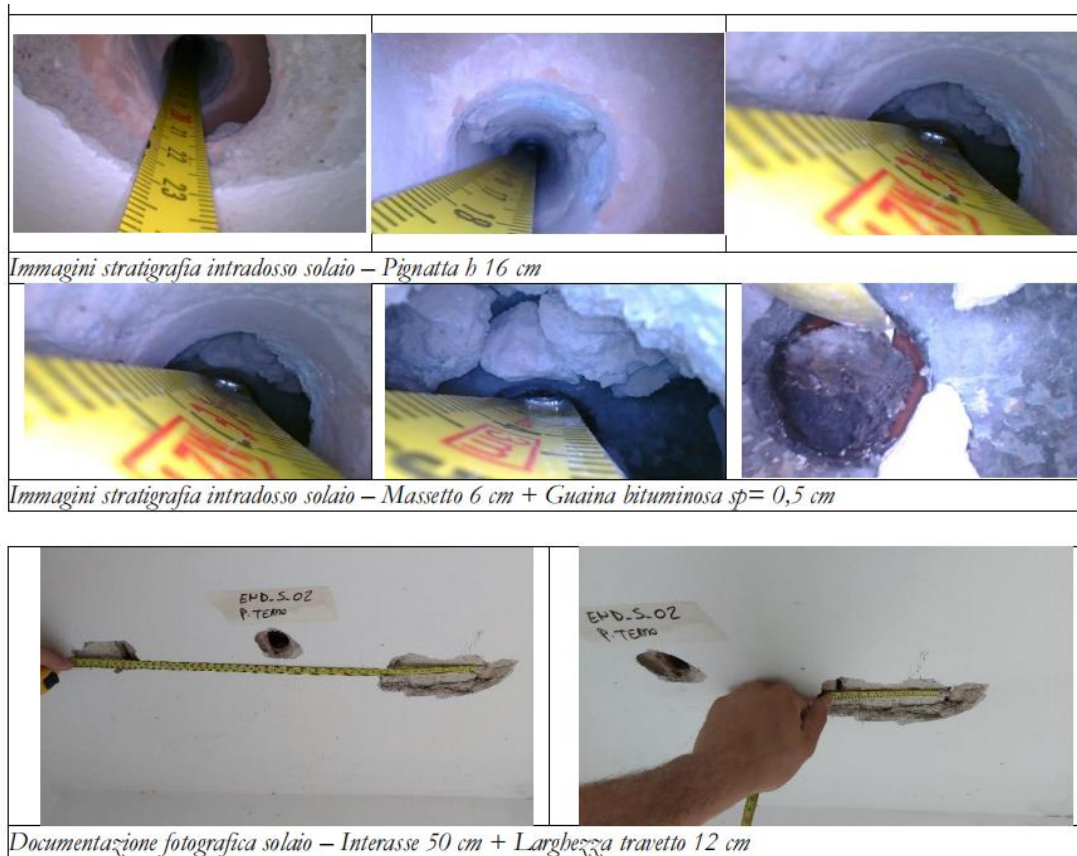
layers measurement\_Ground Floor ceiling (END\_S\_02)
